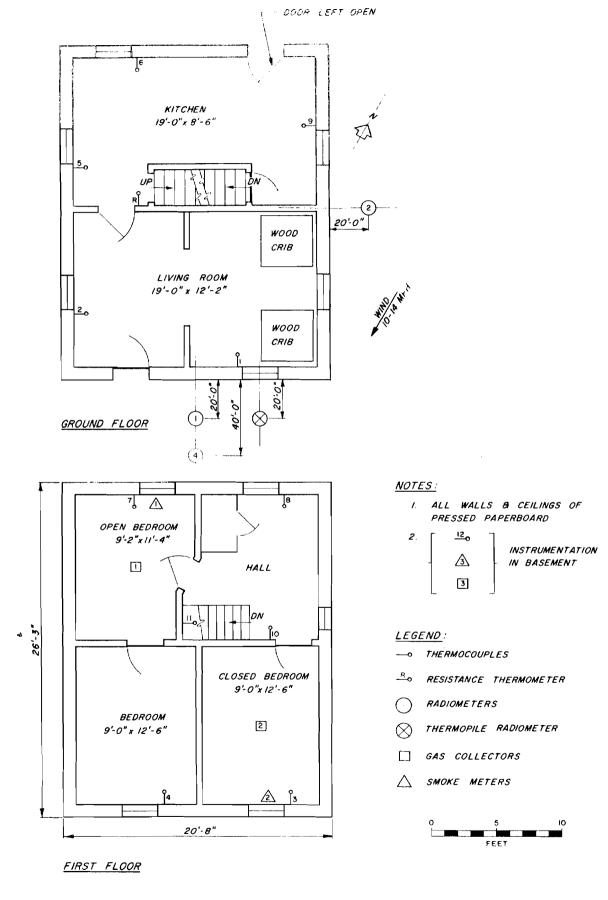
BUILDING No. 5- TWO - STOREY WOOD FRAME DWELLING WITH CLAPBOARD EXTERIOR
